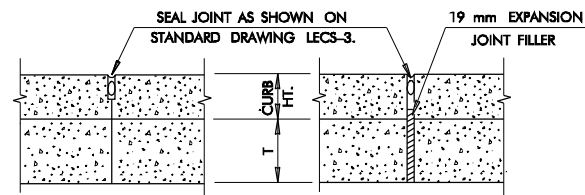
DETAIL OF CURBS ADJACENT TO RAILROAD CROSSINGS
